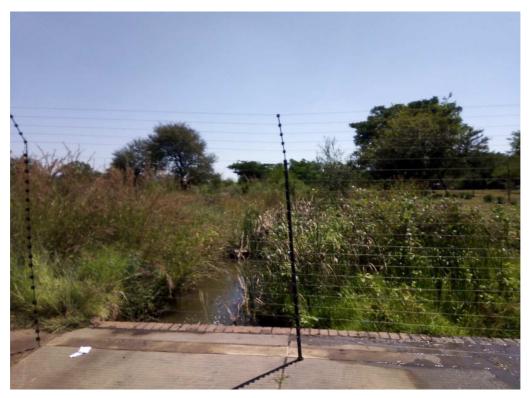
Low level bridge and road crossing over stream (Tsamma St)
